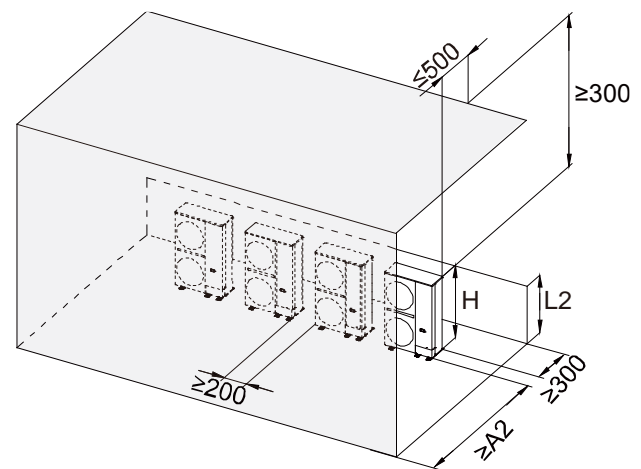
More than one outdoor unit installation (unit: mm)
